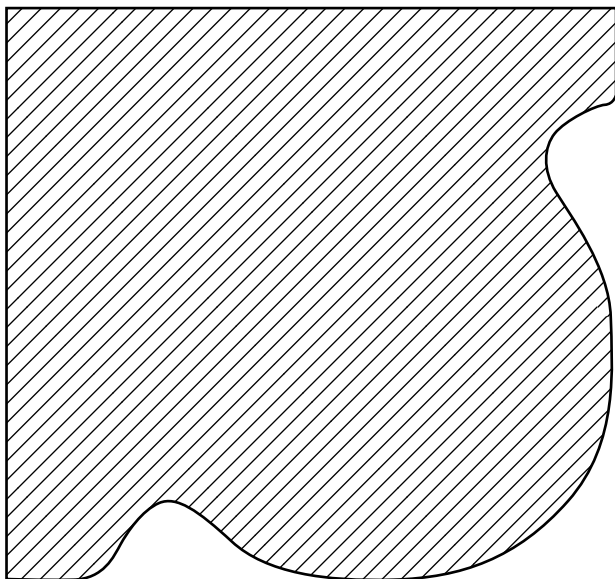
Roll moulding profile for fireplace No.59 east end of first floor hall
